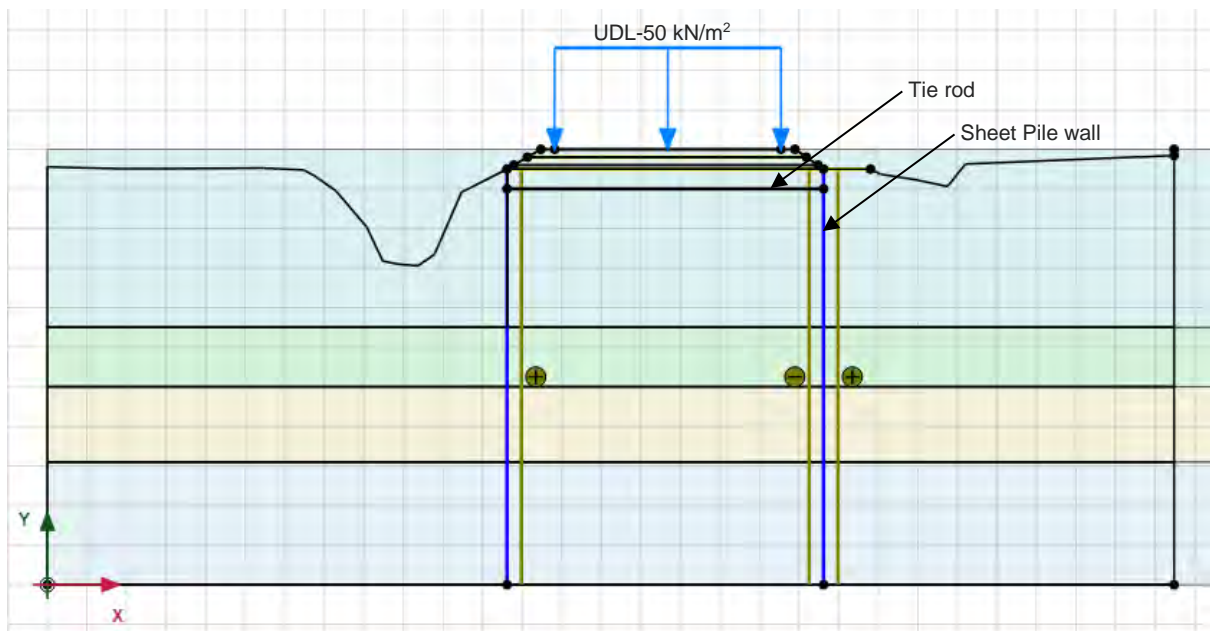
Plaxis Model of Double Sheet pile wall with reinforced ties
